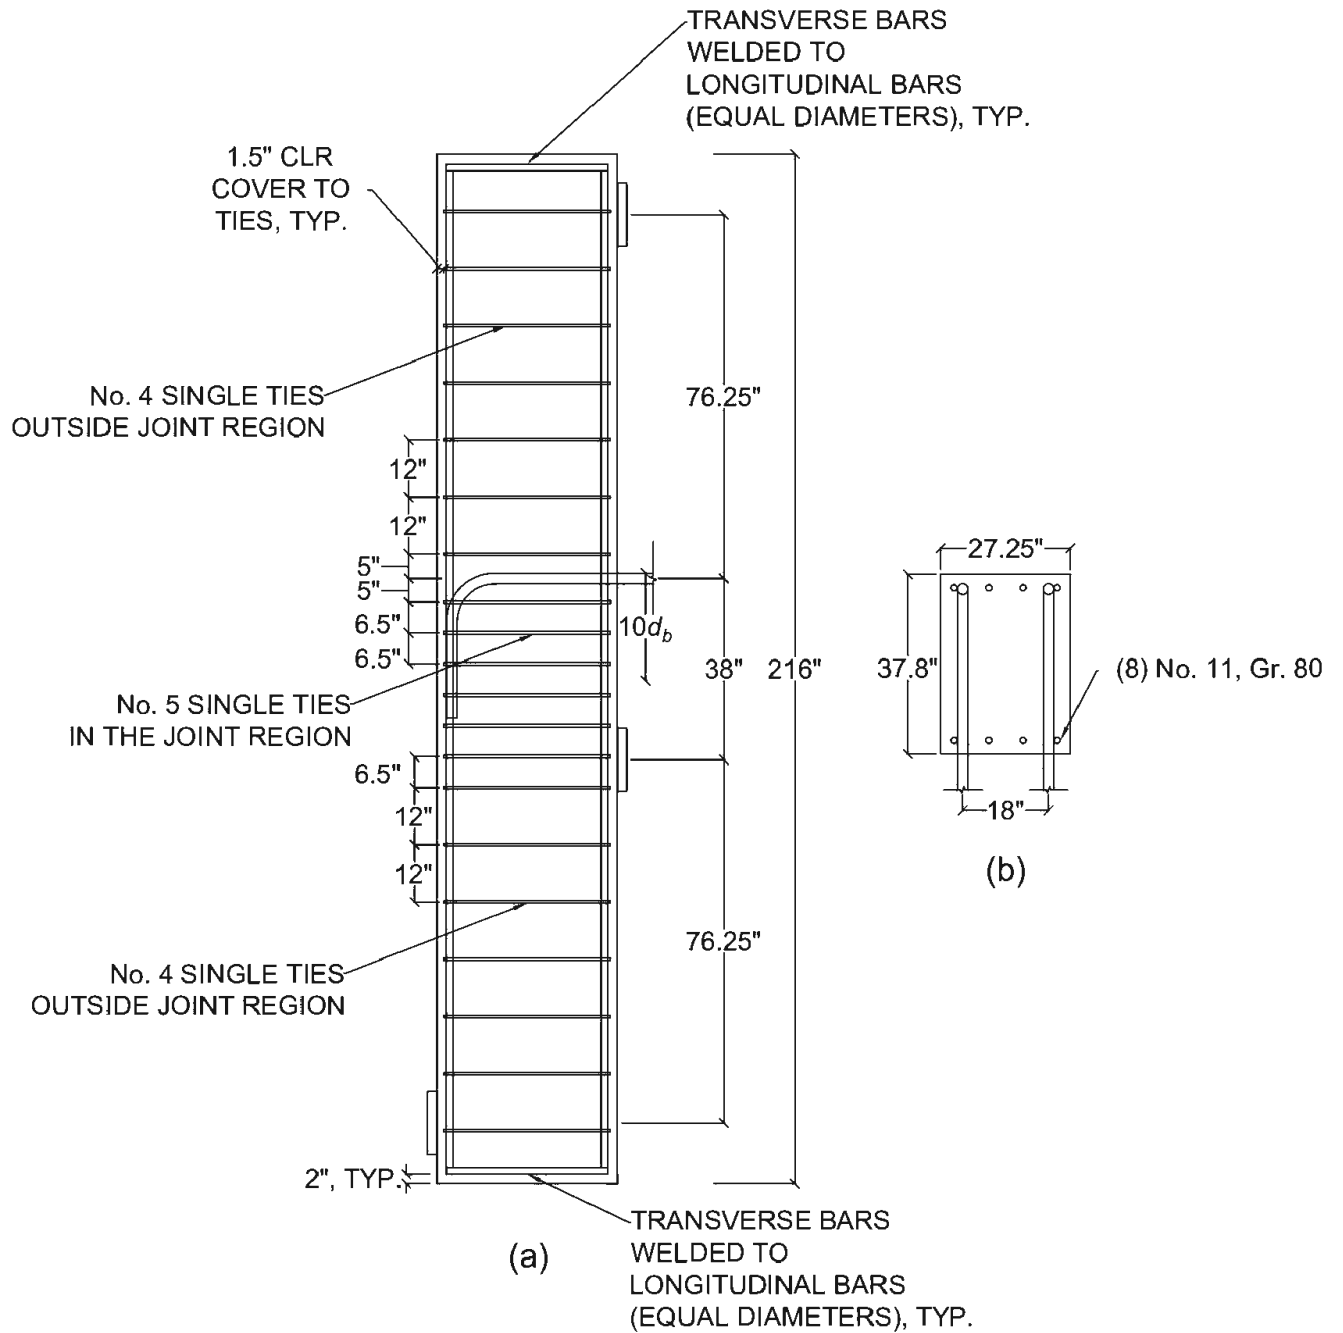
Details of reinforcement layout for No. 18 hooked bar specimen H18-3: (a) elevation, (b) cross-section
